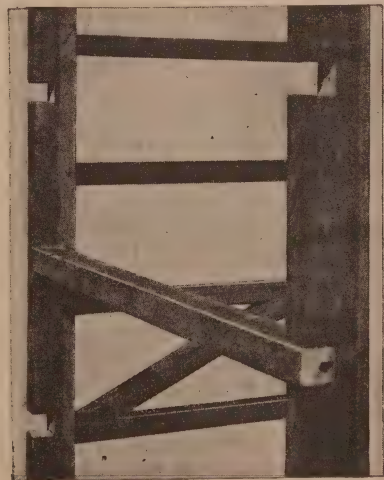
Building Turned Up to Cut Slots for Joists, Two Slots Cut, One Joist in Position
